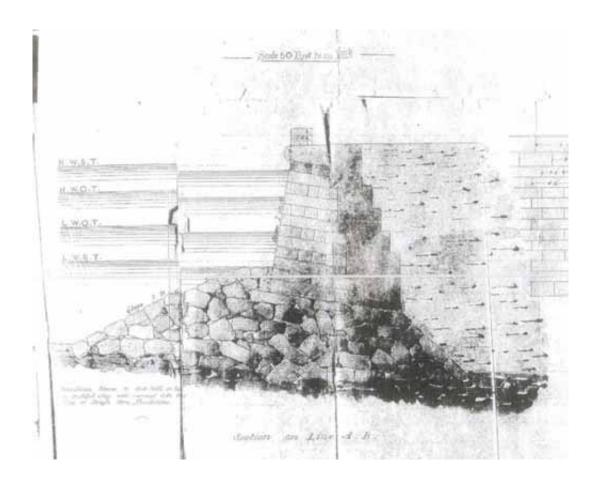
b Example of a pierre-perdue foundation; note the rounded capstone similar to the construction to the east and west praya in 1860's
